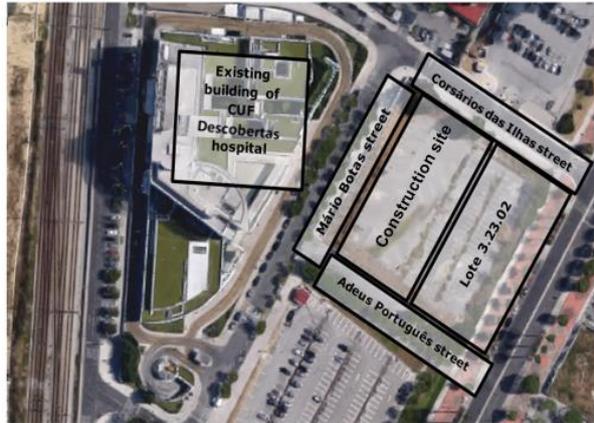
Plan view of the construction site area and the neighborhood conditions
